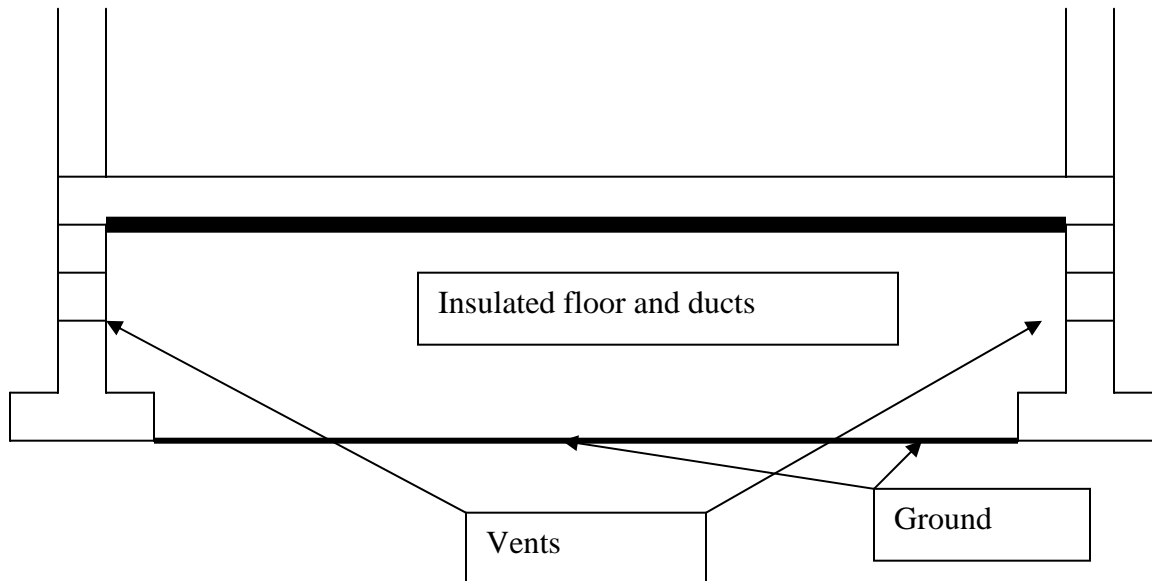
Crawlspace with insulated floor and ducts with perimeter wall vented.
